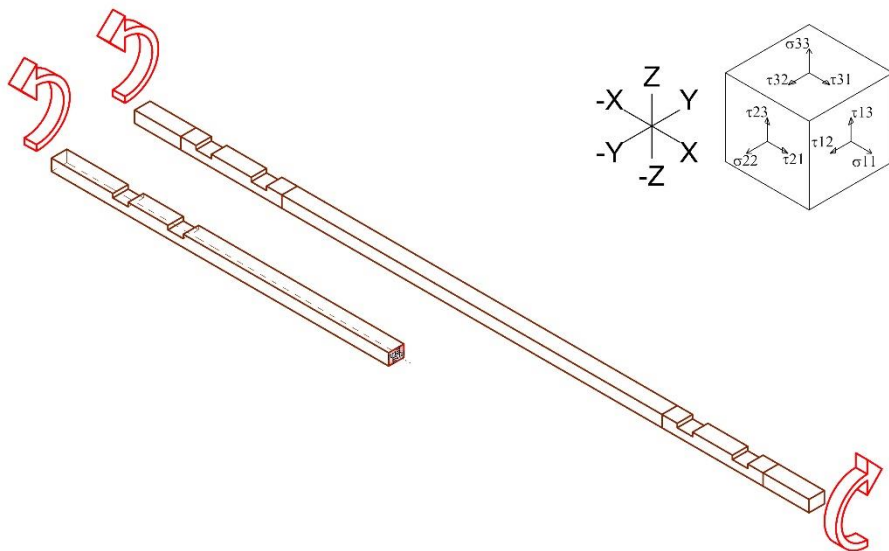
Roof Rafter - Torsion: M_x on x axis
